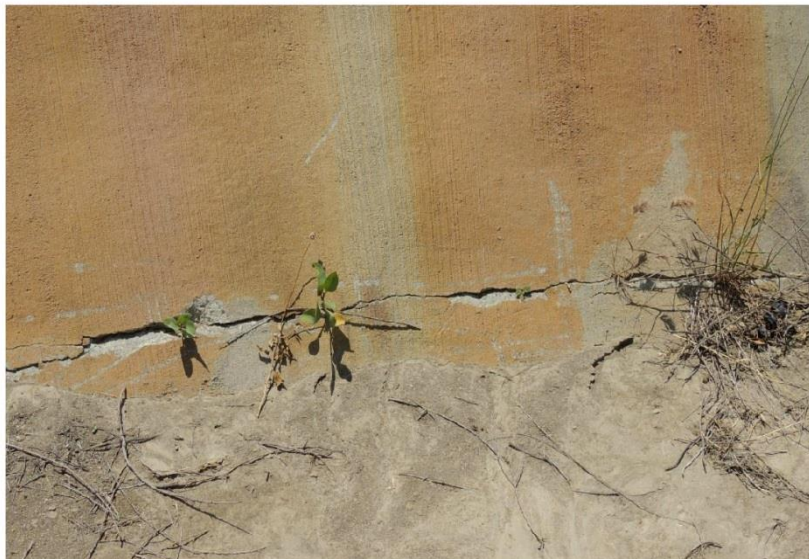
Cracked sidewall of drainage channel with vegetation growing
